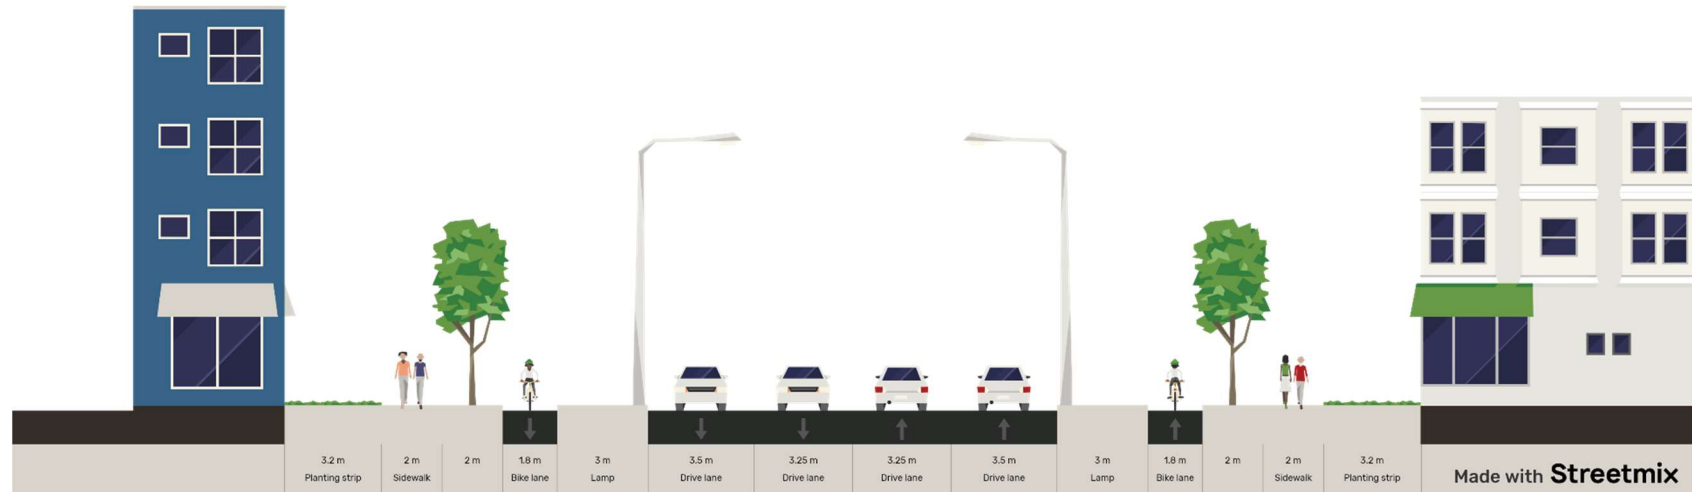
Cross-Section of Street 1 - West of Street 9 /11
